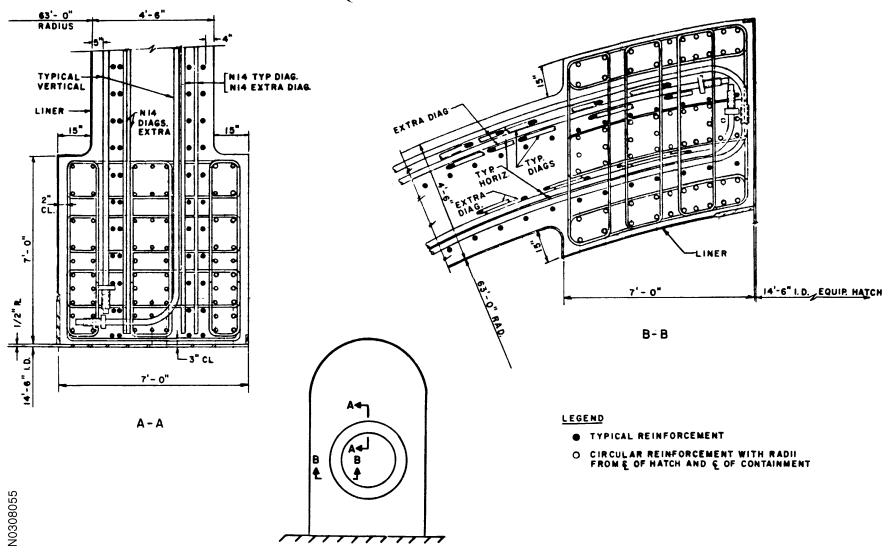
REINFORCING DETAILS: PERSONNEL HATCH OPENING
